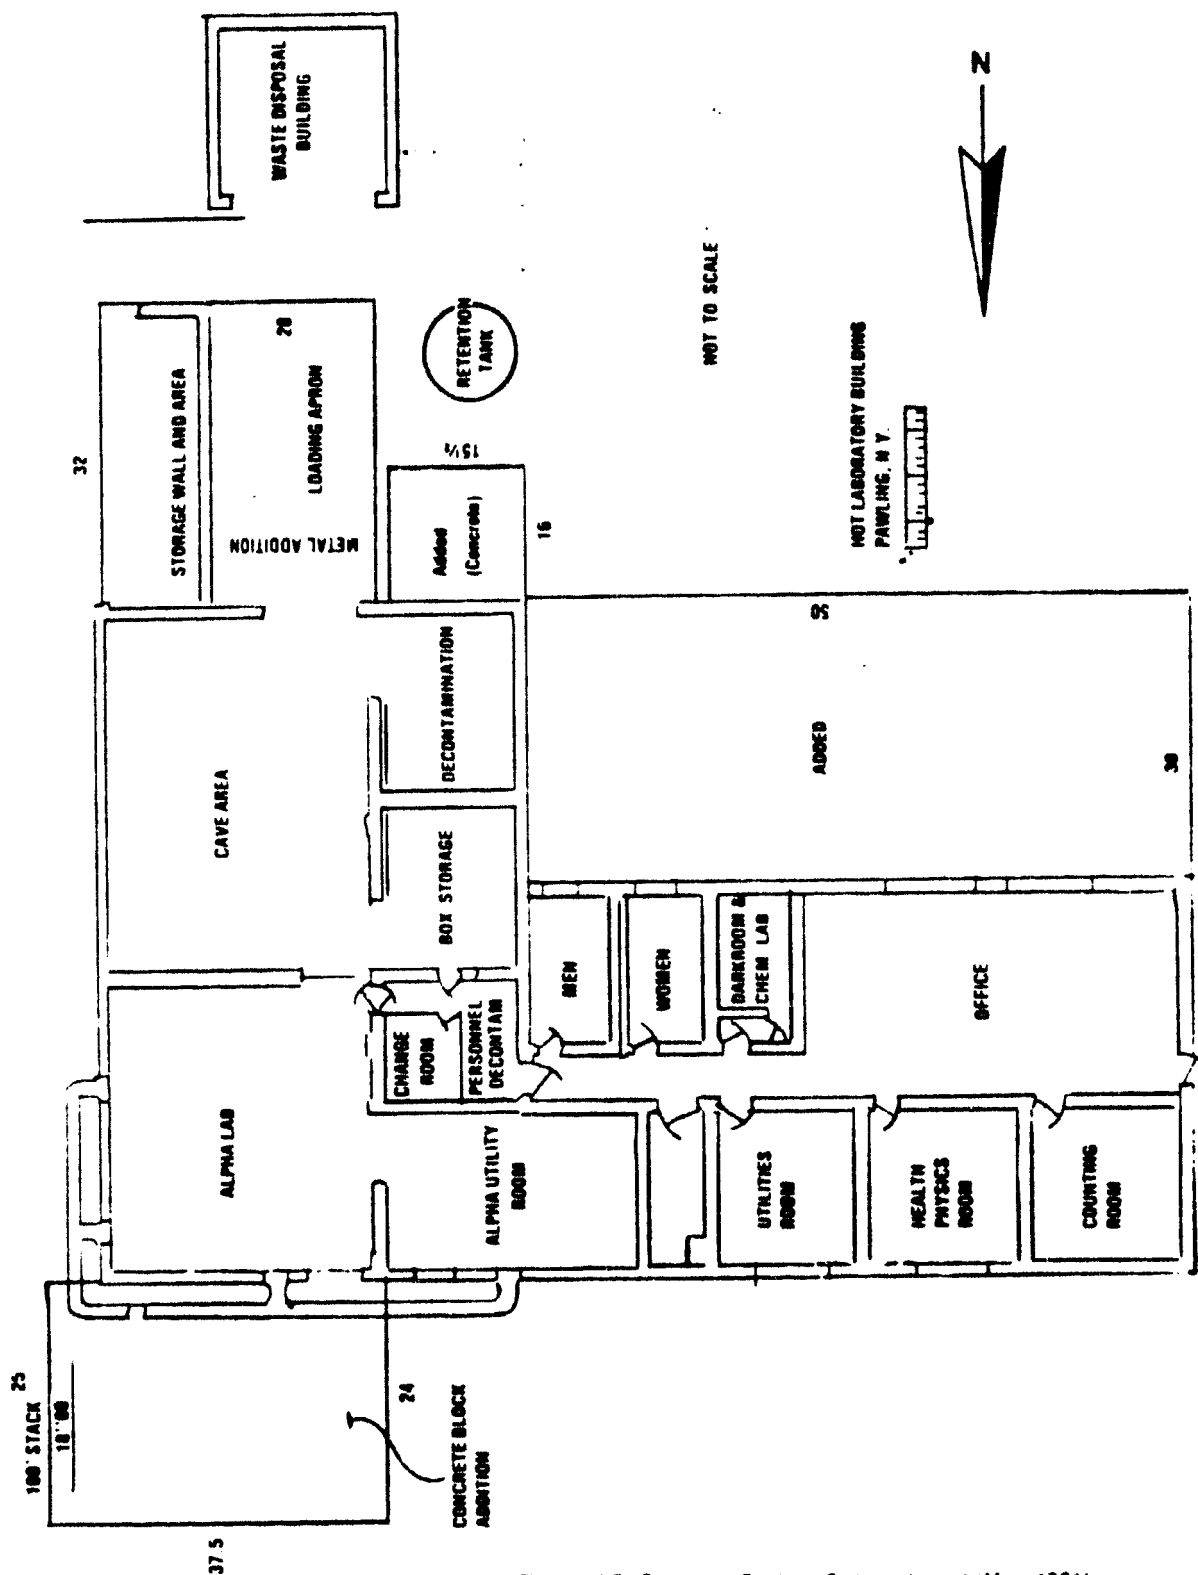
Plutonium Facility - Building Layout (May, 1961)
